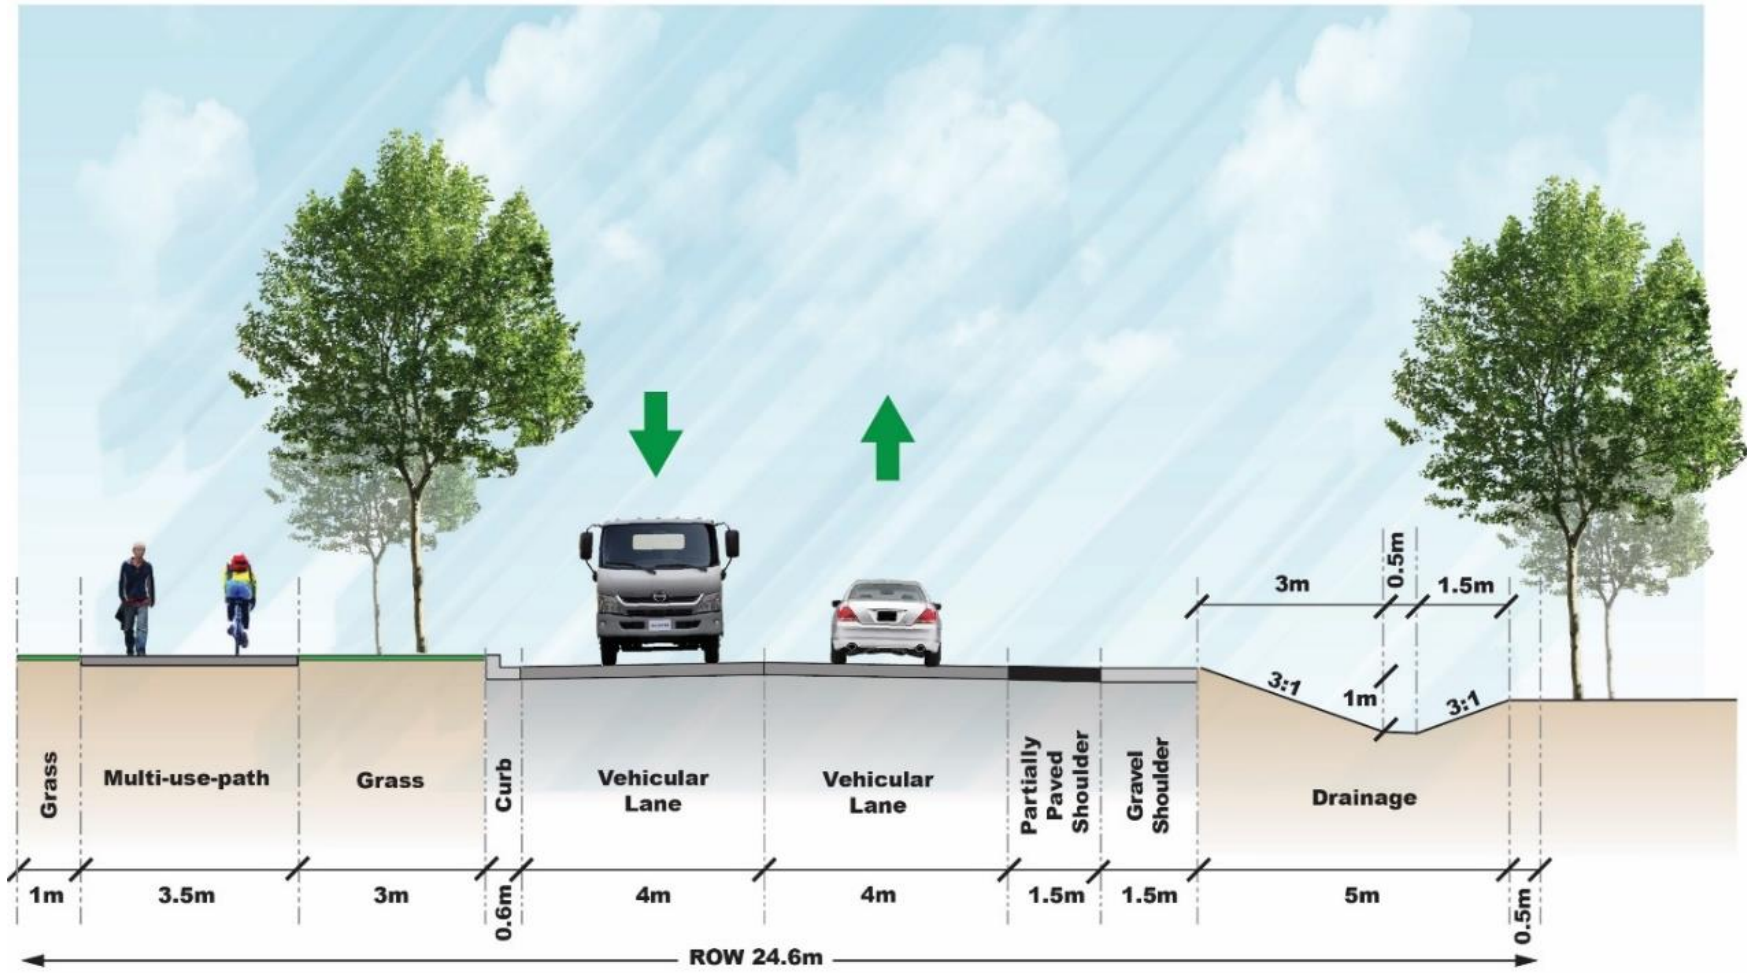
Streetscape Cross Section - Rural Edge Route
